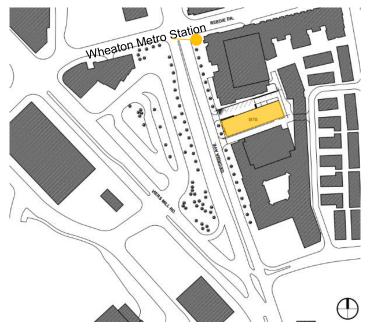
Building Location on Site, Courtesy of Bonstra Haresign Architects
